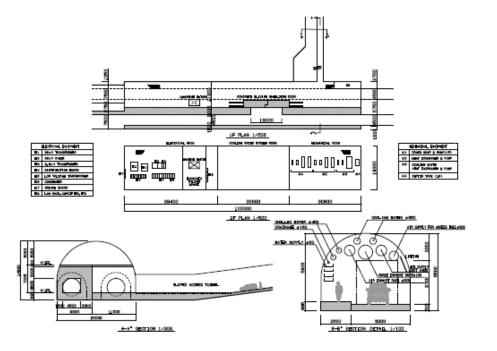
Detail of an access ramp for the Asian Sample Site
